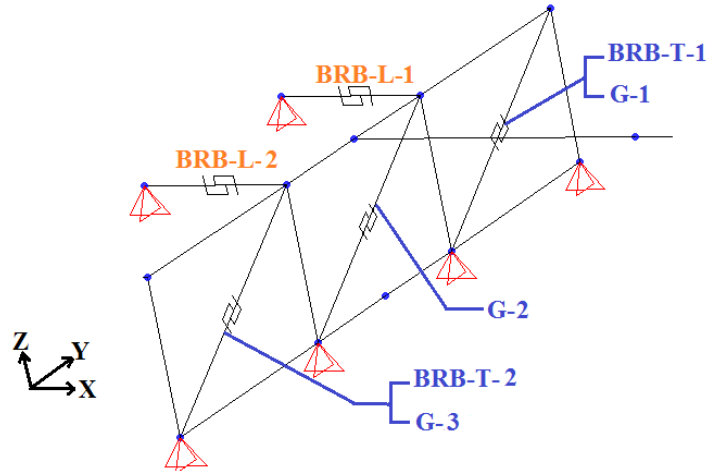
EDS-1 with two longitudinal BRBs on top of Abutment-1 in the new multi-span bridge model
